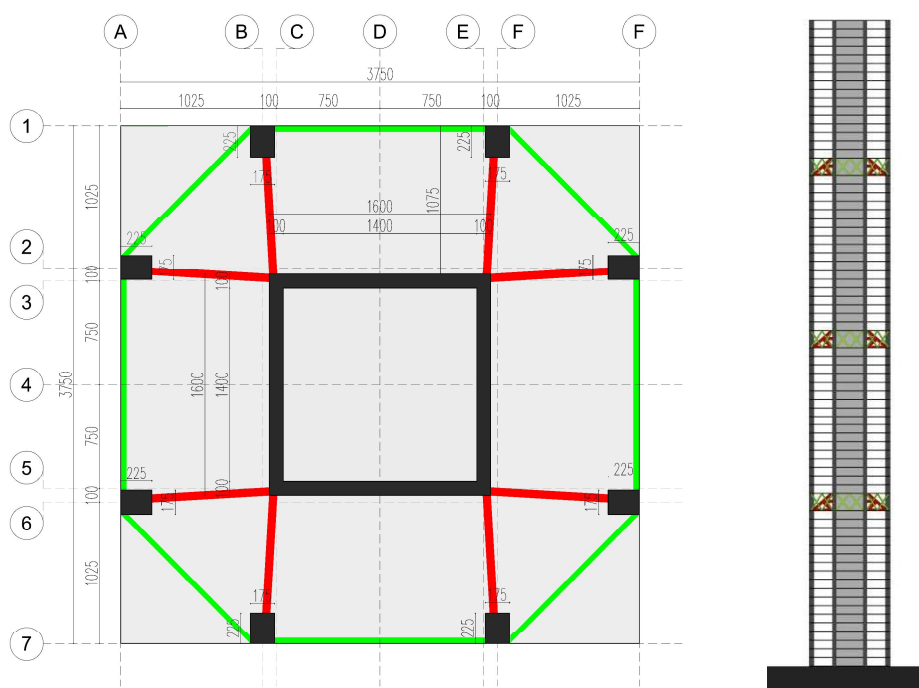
Typical floor plan and elevation of model "OF_OPT_4b" with outriggers
